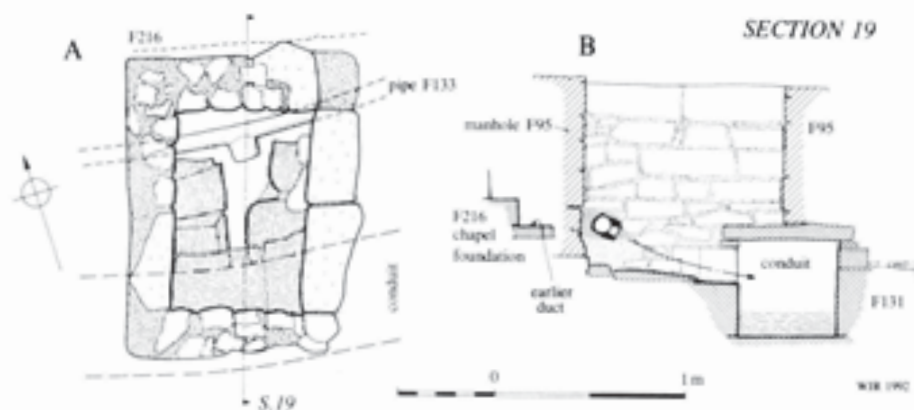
Manhole, F95. A Plan showing the washout point on the water-pipe (F133) and the channel leading from it into the conduit; B Section showing the relationship between the pipe-duct of 1477, lodged on the chapel foundation (F216), and its subsequent repositioning within the manhole. Scale 1:40
